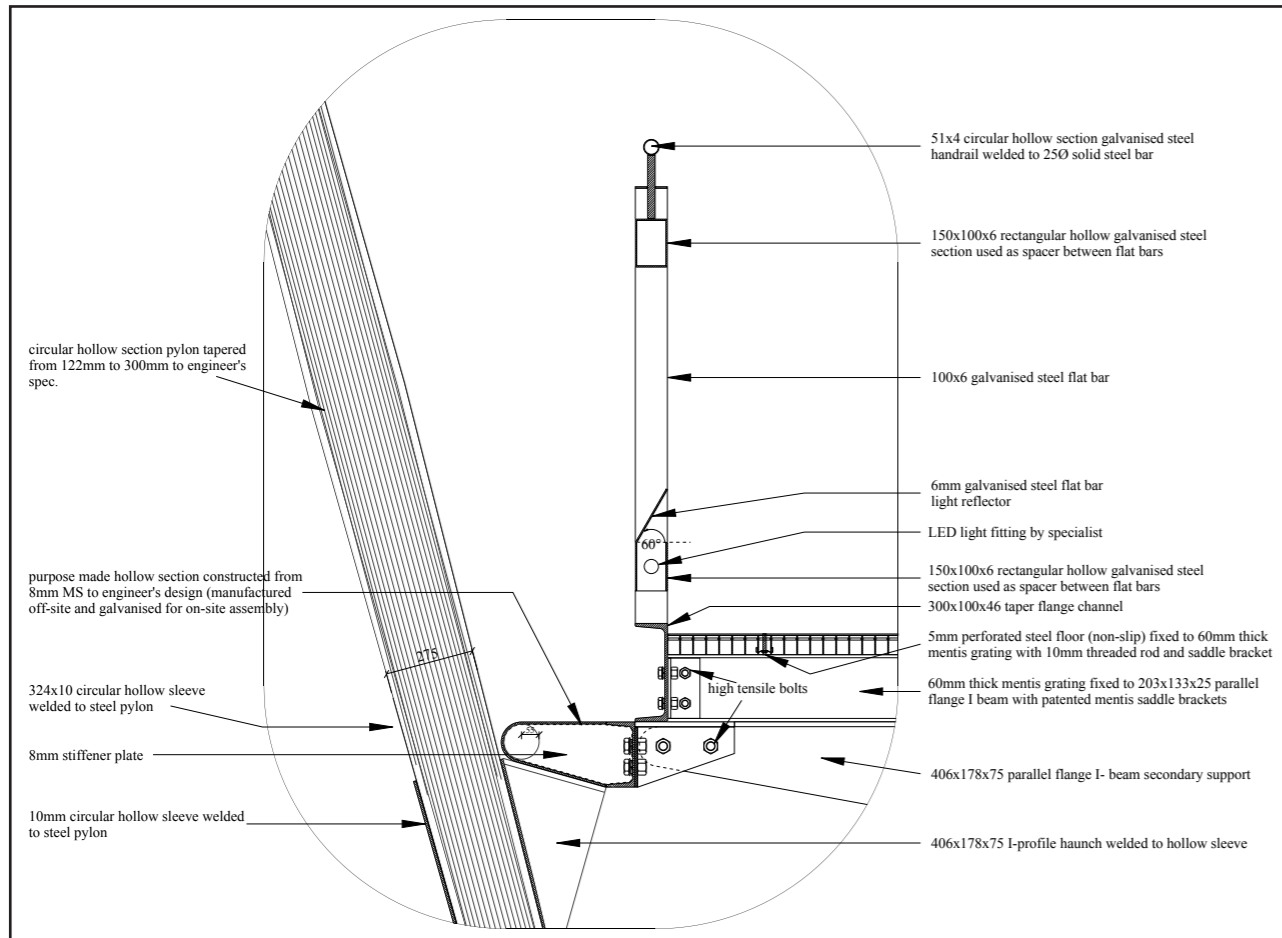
Detail D03: Structural detail of walkway of bridge.
